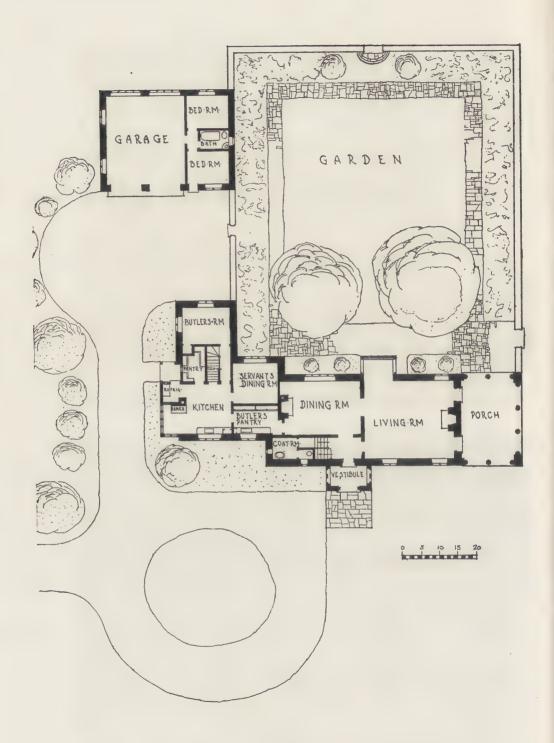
FIRST FLOOR PLAN—HOUSE OF ARTHUR KAHN, HARTSDALE, N. Y. ALFRED HOPKINS, ARCHITECT.
